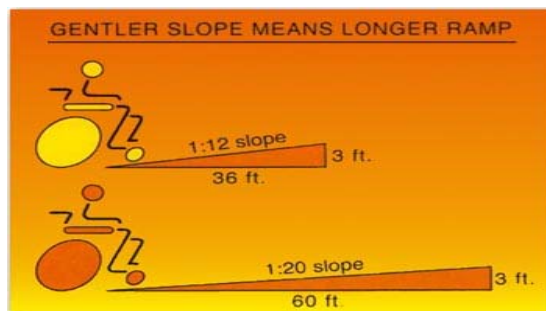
A: Ramp dimensions shown illustrate the maximum dimensions acceptable for specific ramps
